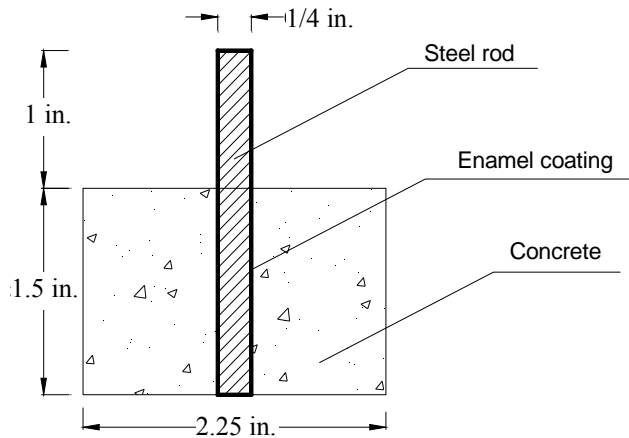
Specimen dimensions and schematic view of pin pullout specimens.
